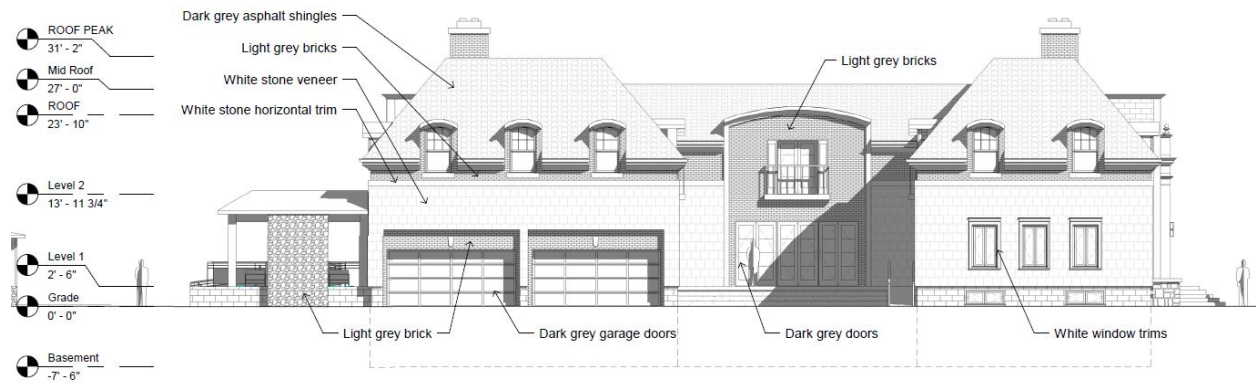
North elevation, 2230 Mississauga Road. (Image from client.)
